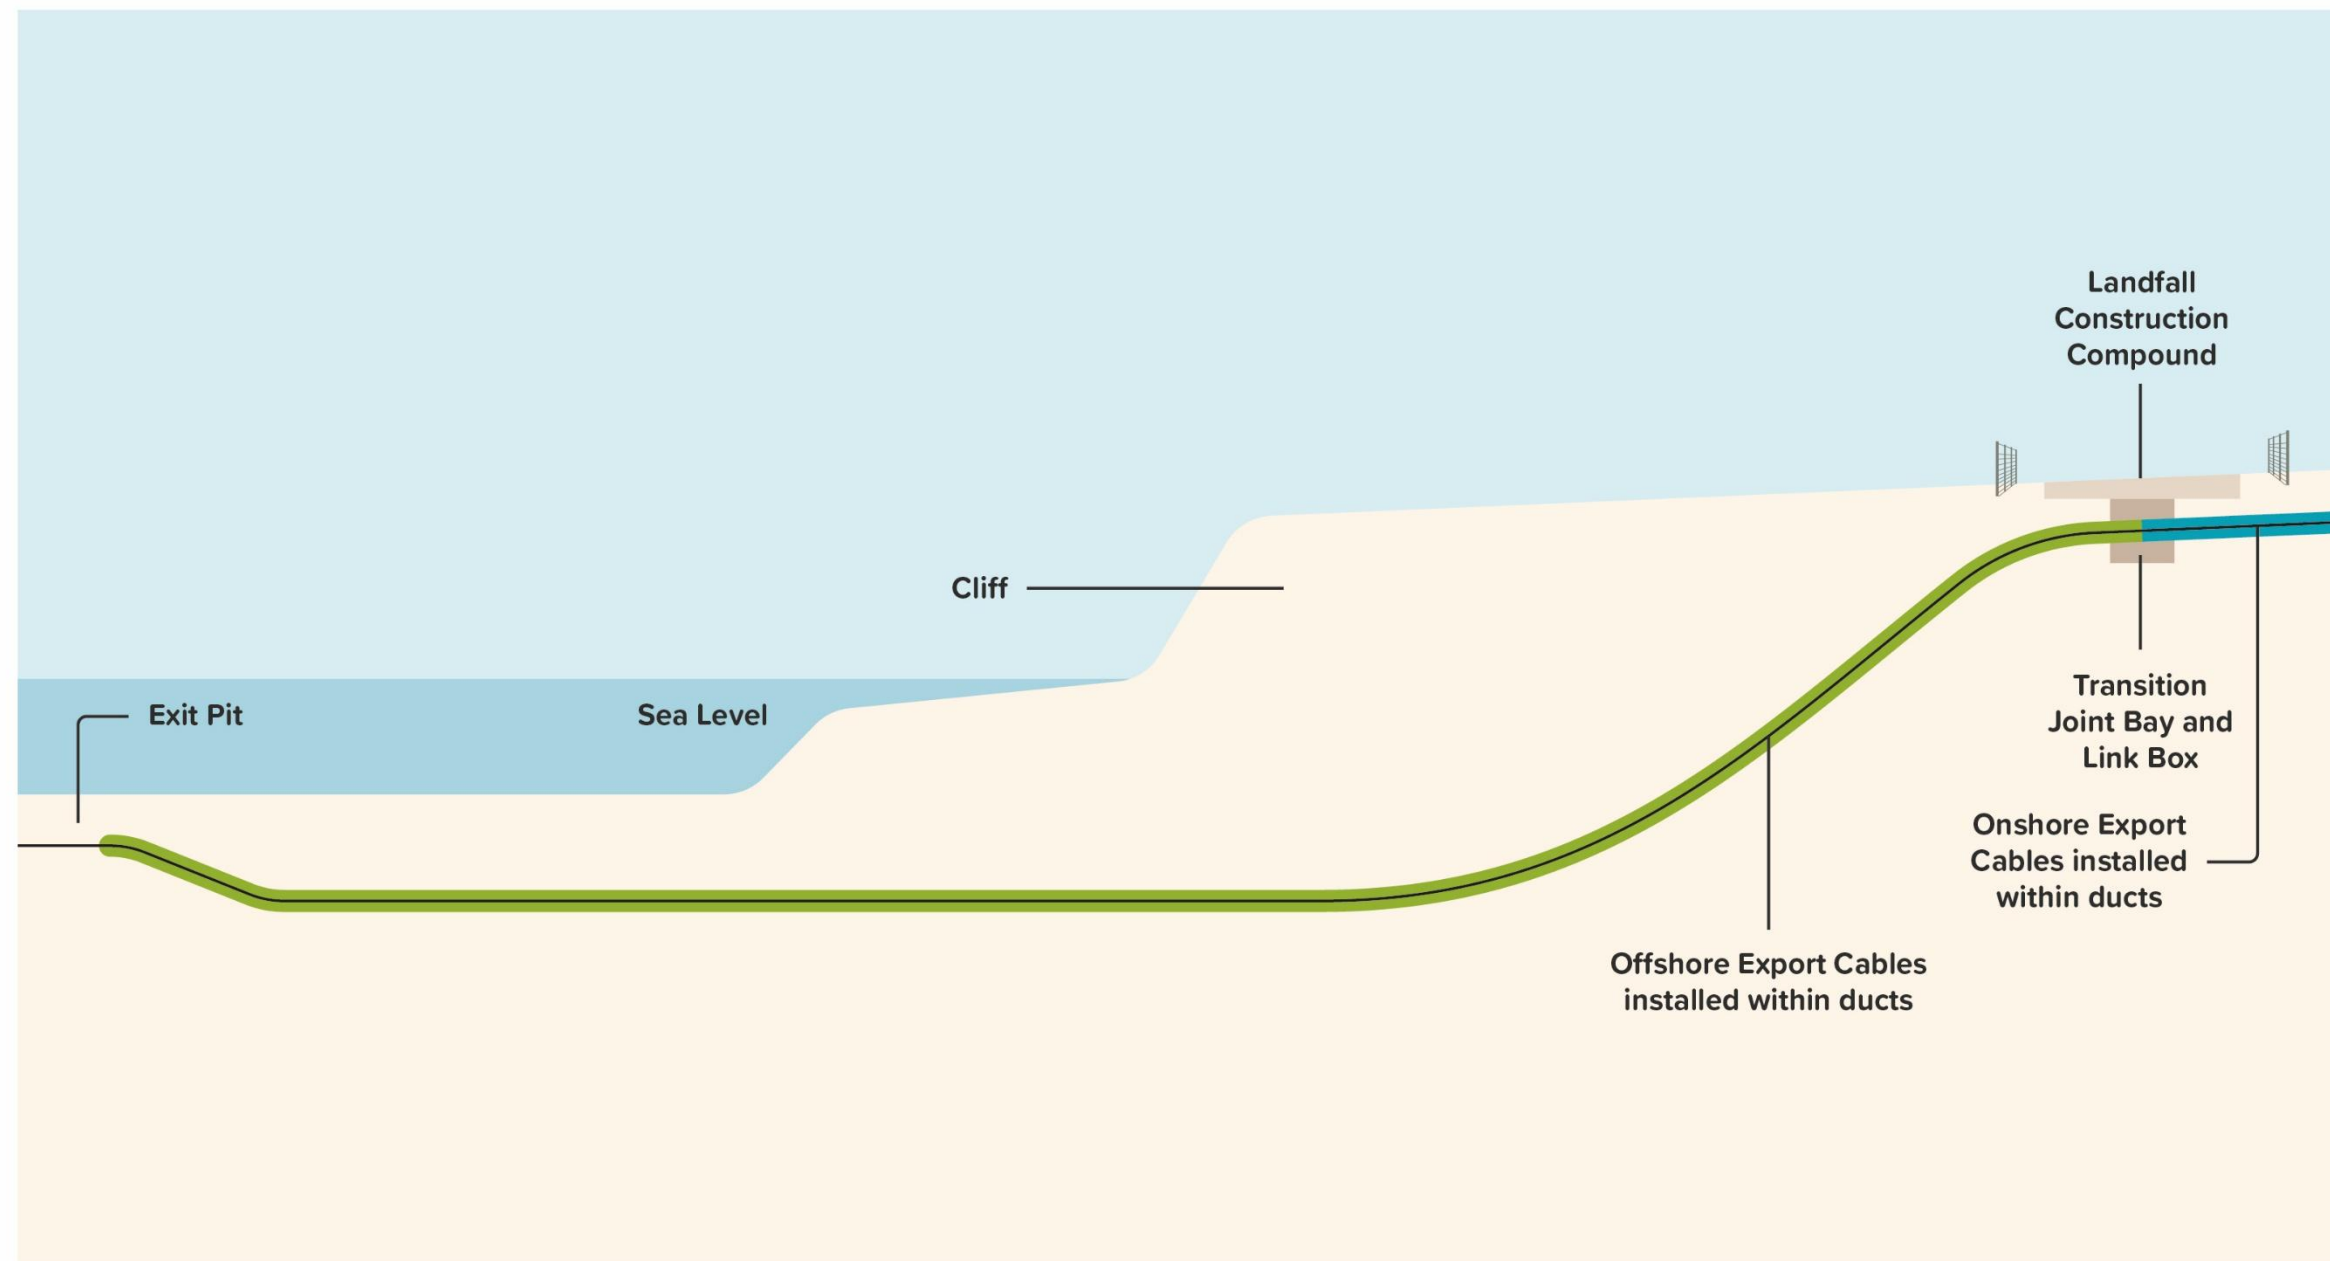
Indicative Cross-Section of Landfall Trenchless Installation Works
